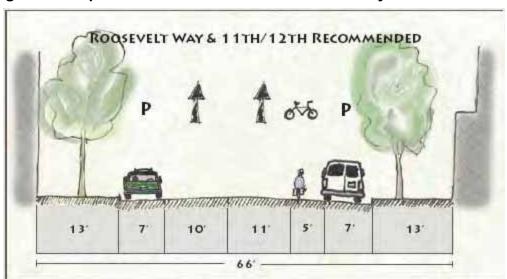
Proposed 11th Avenue and Roosevelt Way Cross-Section
